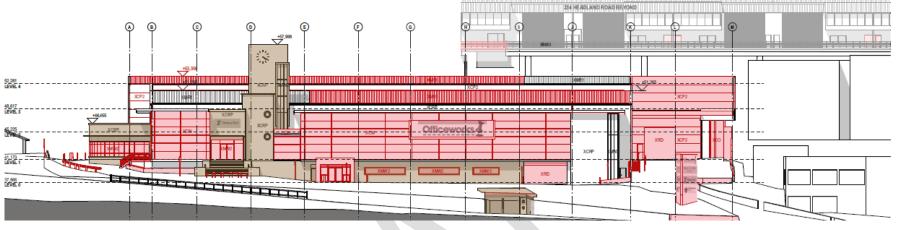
West Elevation demolition plan (Source: TZG Architects, A-035, Revision A, October 2019)
